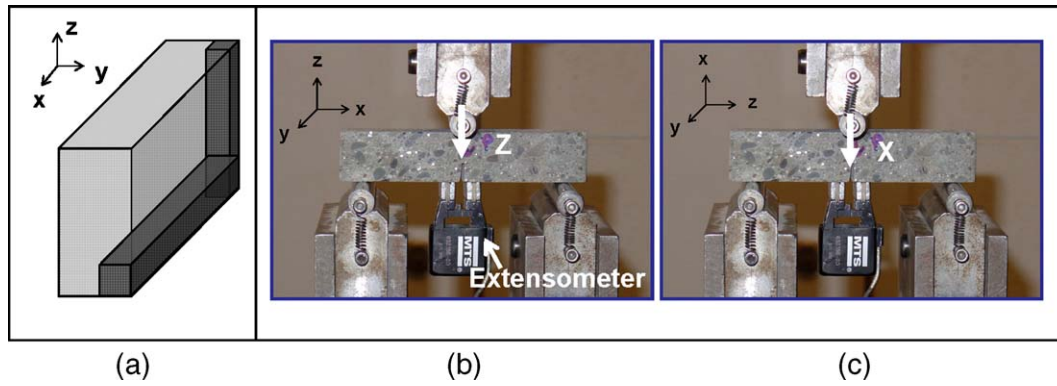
Small beam specimens were cut out of the beam parts (a) and tested in the Z (b) and X directions (c).
